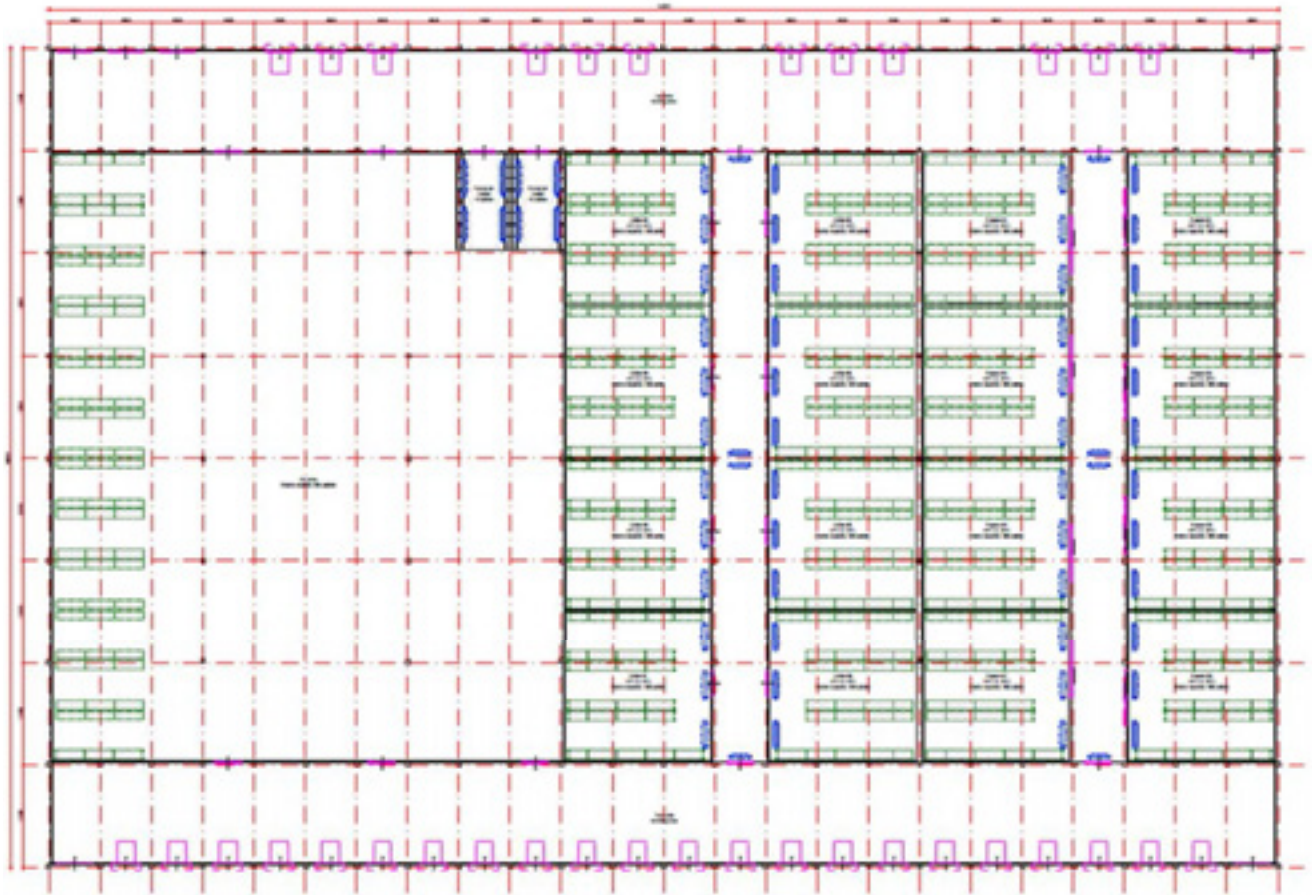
TECHNICAL DESIGN COOL PORT ADDIS
